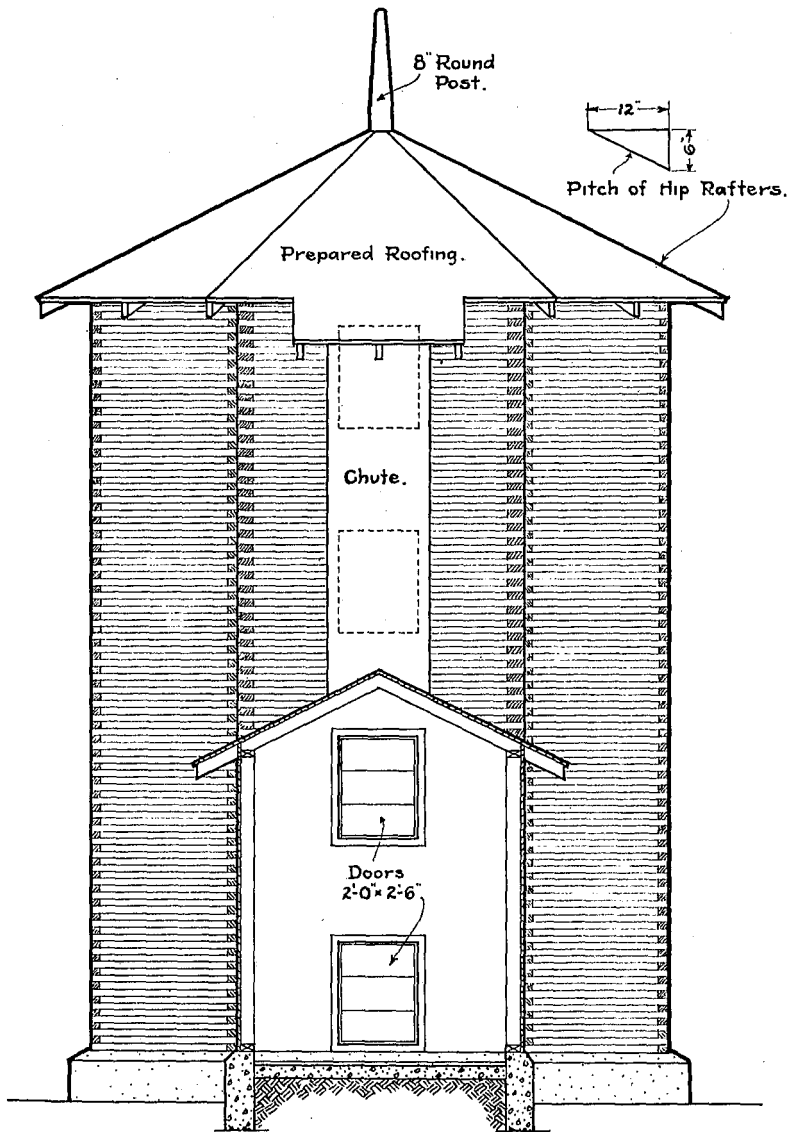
Architect's Drawing of Front Elevation of Crib Silo
